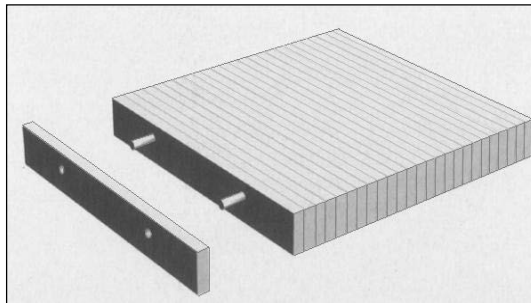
Edge-fixed floor elements, dowelled (Kolb 2008)
